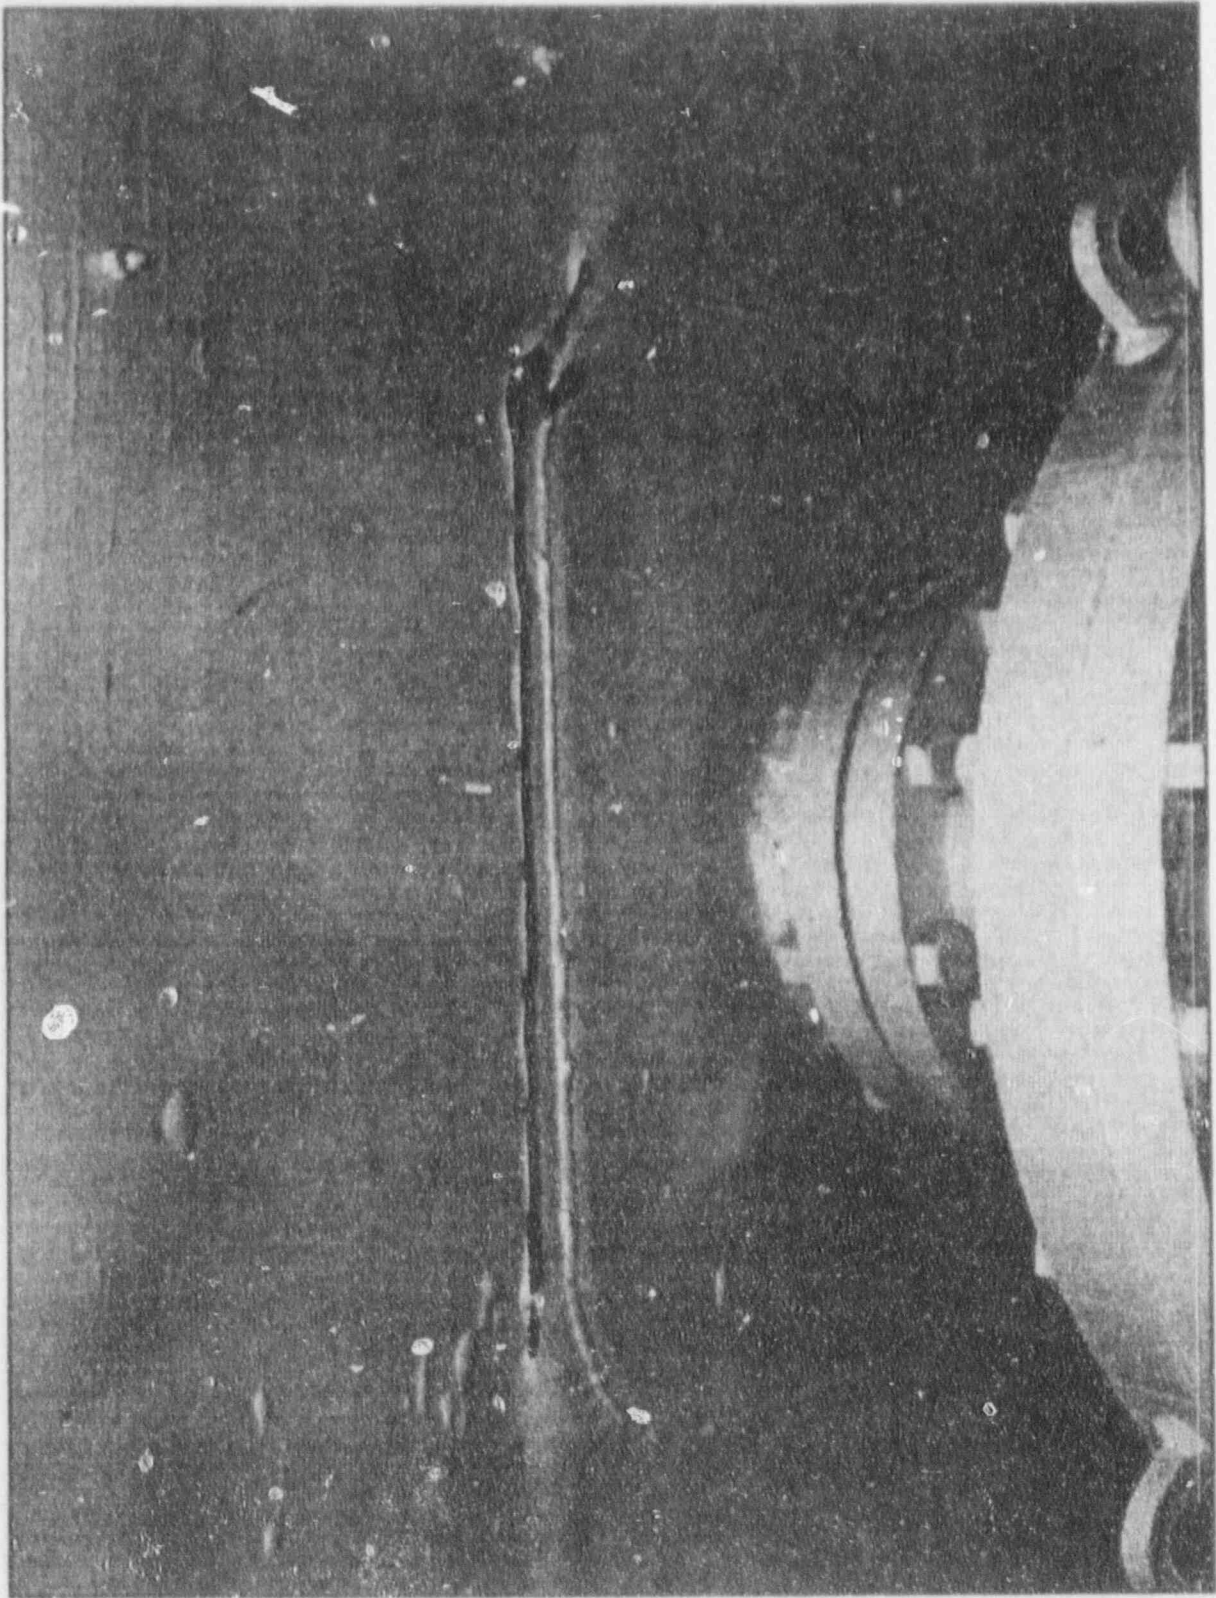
Liner Tear in 1:6 Scale Reinforced Concrete Containment
